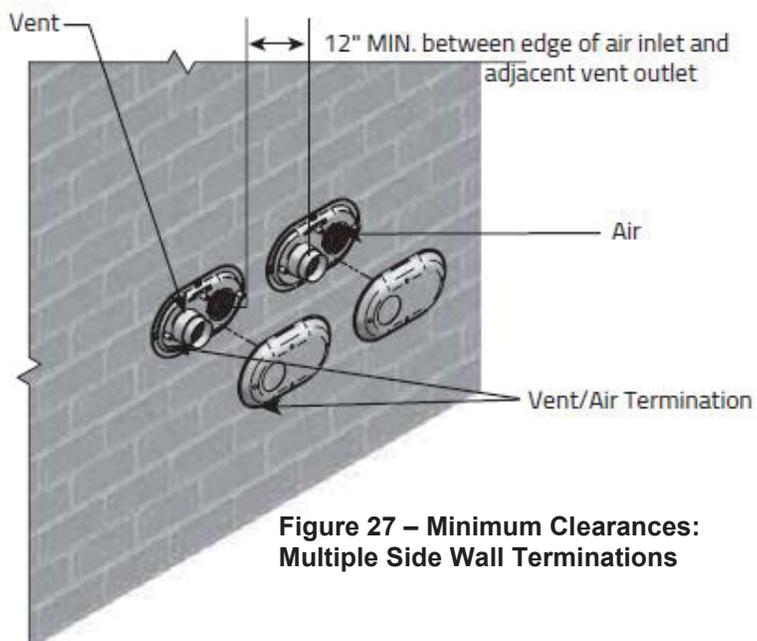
Minimum Clearances: Multiple Side Wall Terminations
